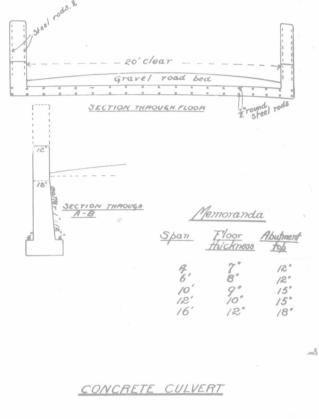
DETAILS OF CONSTRUCTION OF CONCRETE BRIDGES
